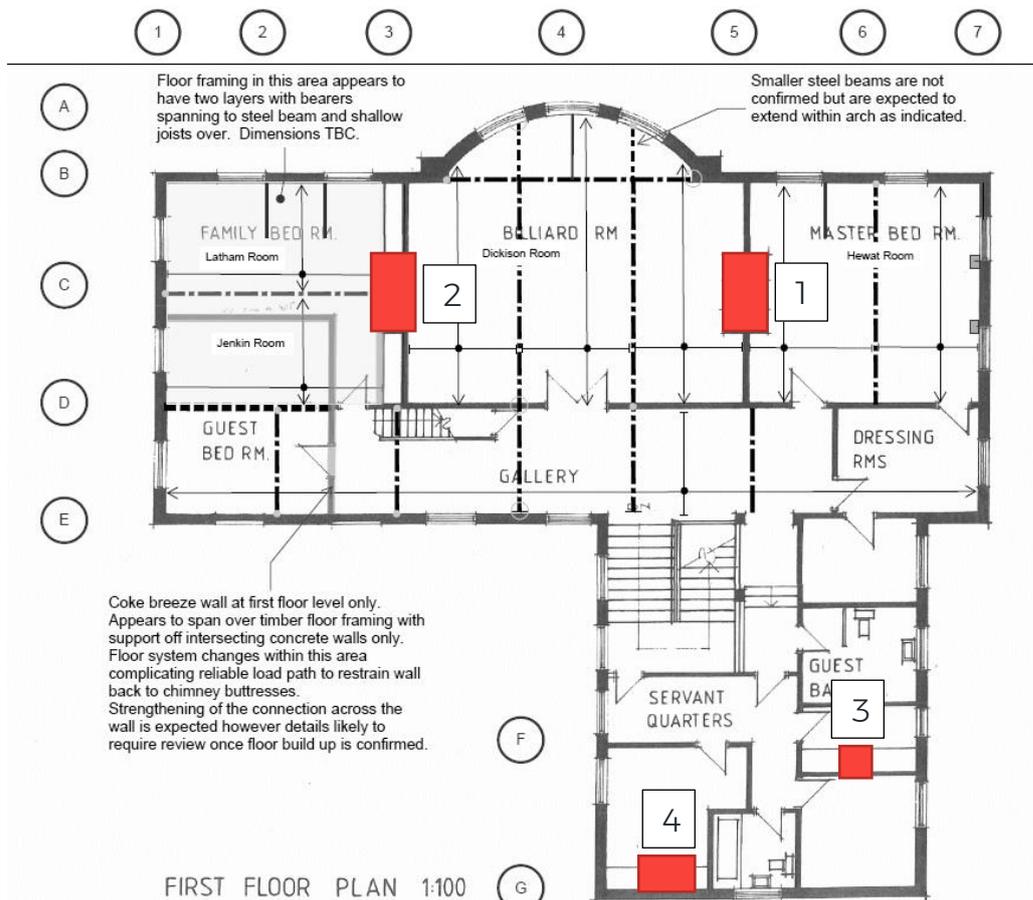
Plan Layout of Anderson House with Floor Beams Highlighted
